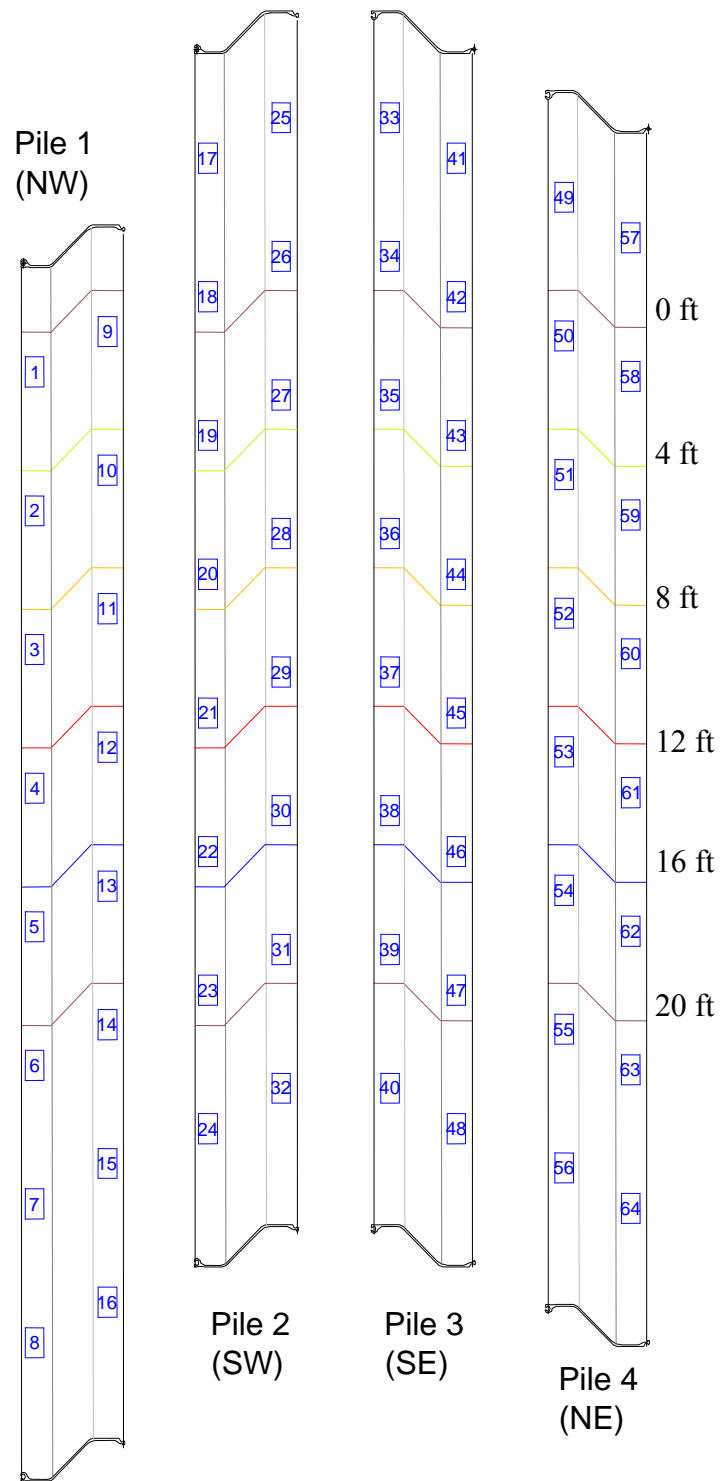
Gage diagram of pile elevations and excavation depths
